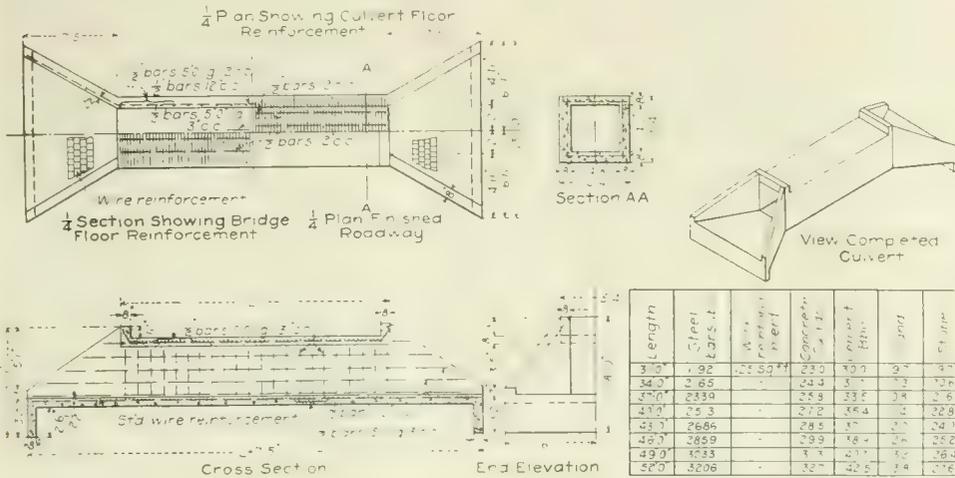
Standard Type of Concrete Culvert with Paved Bottom.
